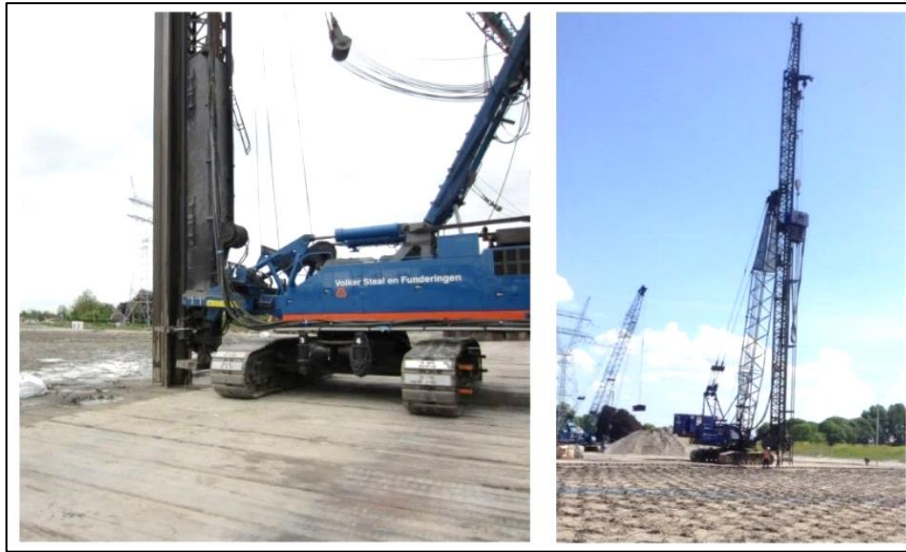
Equipment used for applying horizontal watertight layers of sodium silicate [7].
